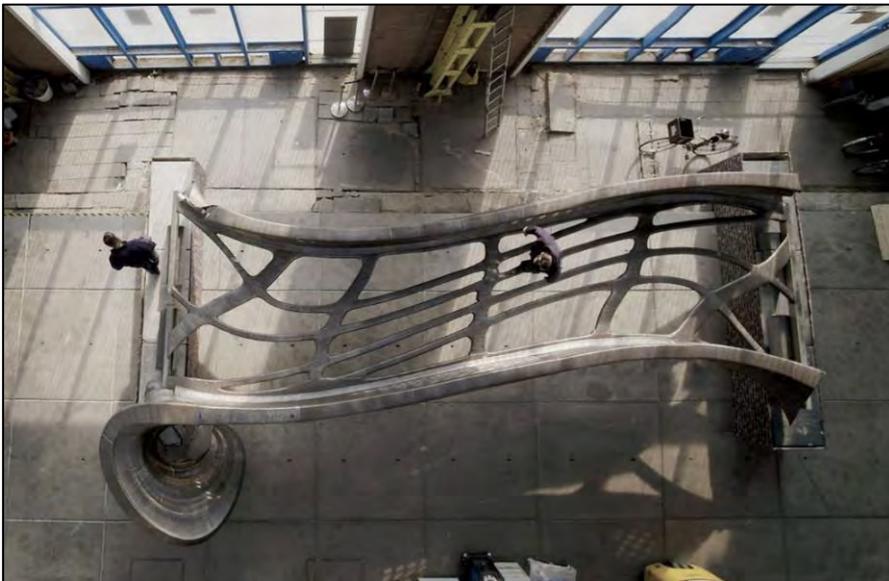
Bridge entirely made of weld metal (3-D printed) by means of robotic welding. MX3D project, Amsterdam
